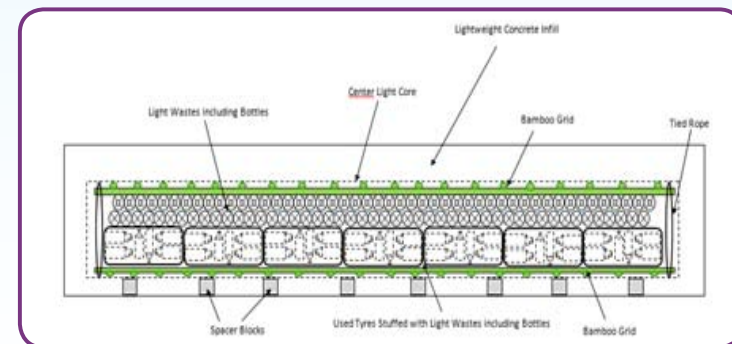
(b) - Typical cross-section of lightweight concrete infill buoyant platform over soft ground
